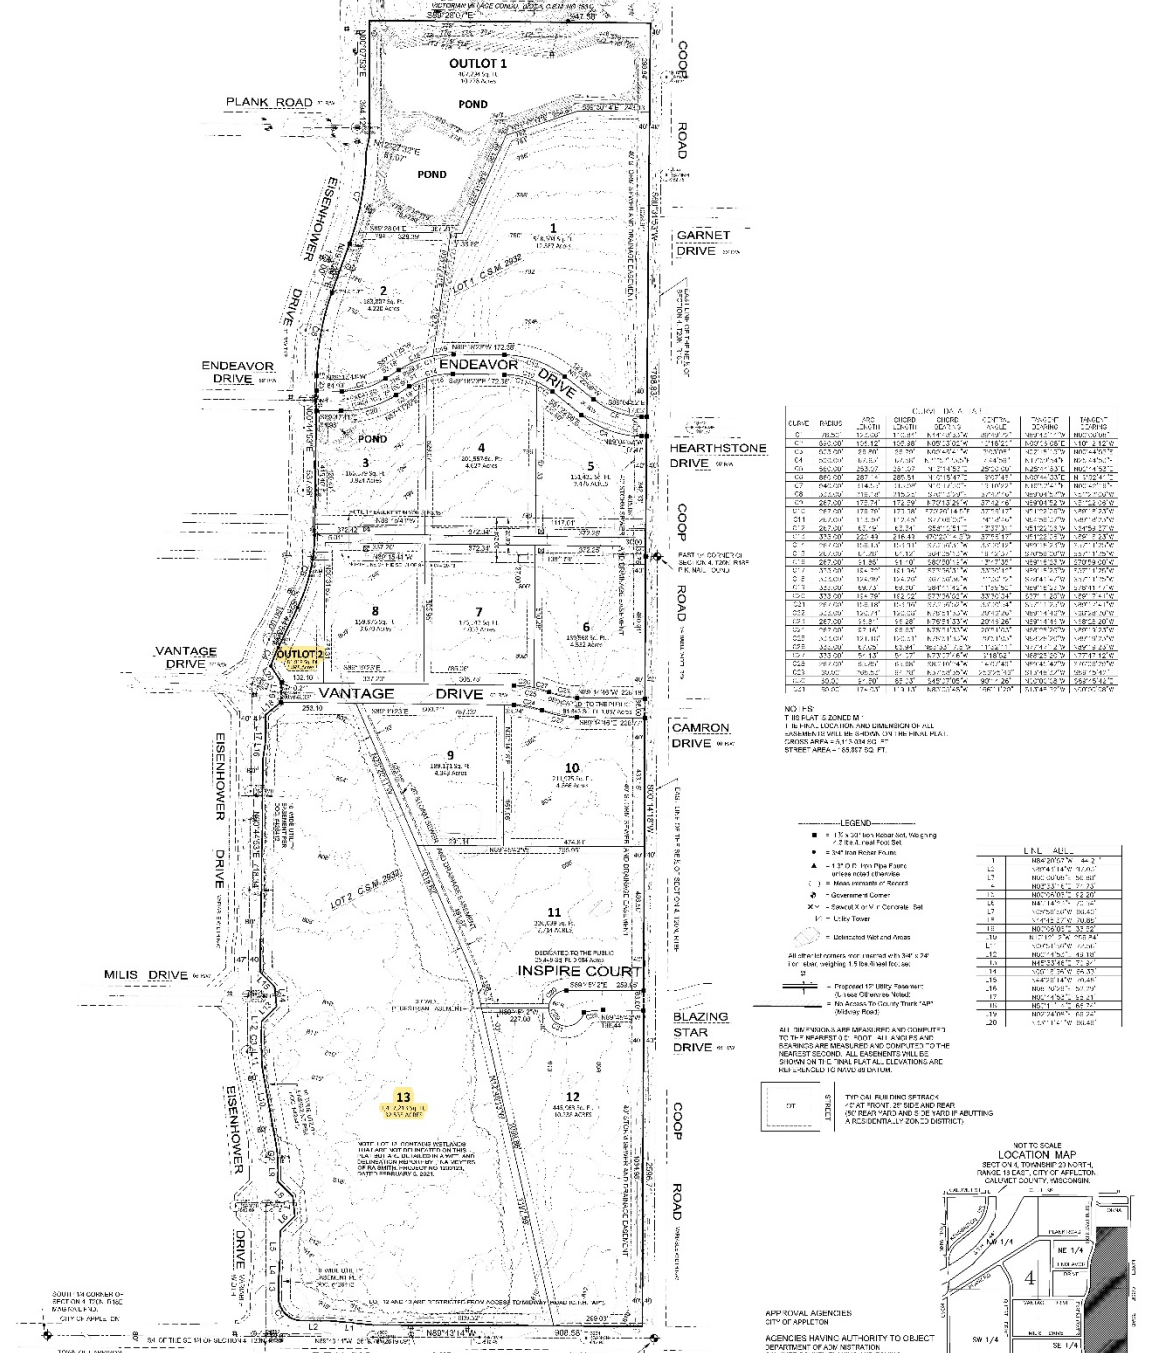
PROPOSED SOUTHPPOINT COMMERCE PARK PLAT NO. 4
